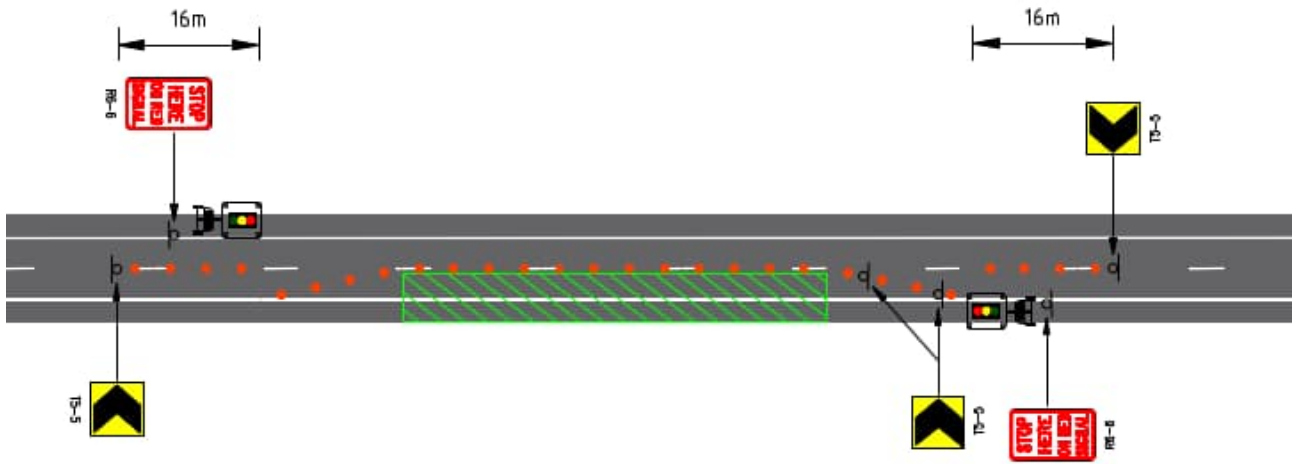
ARRANGEMENT FOR CONSTRUCTION OF ACCESS POINTS
